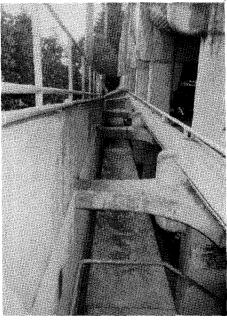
Diaphragm ties between garage and retaining wall in Berkeley.
